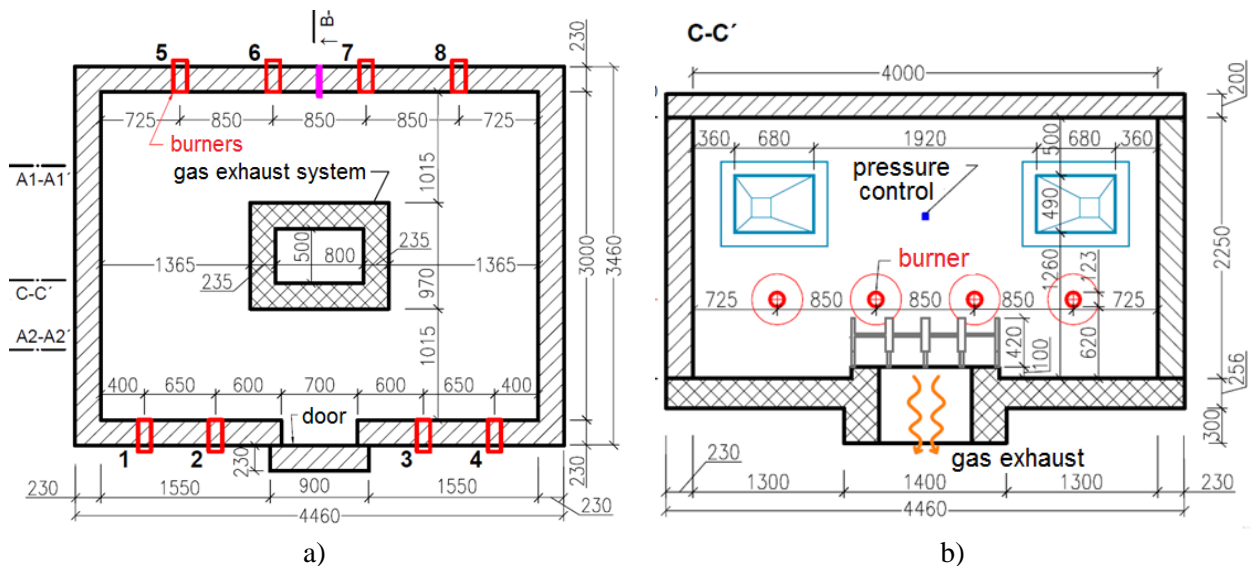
a) Ground plan of the furnace; b) Section of the furnace.
